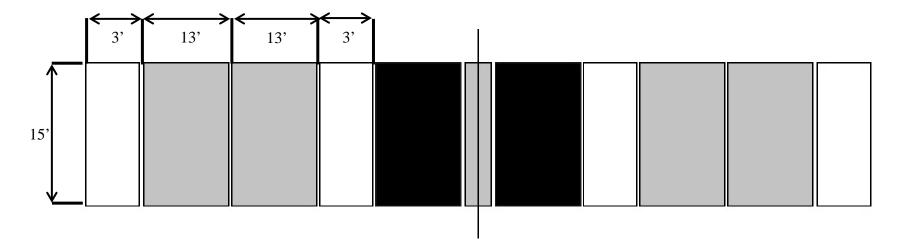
Type I-A, Type I-B and II concrete general structural design – plan view.
